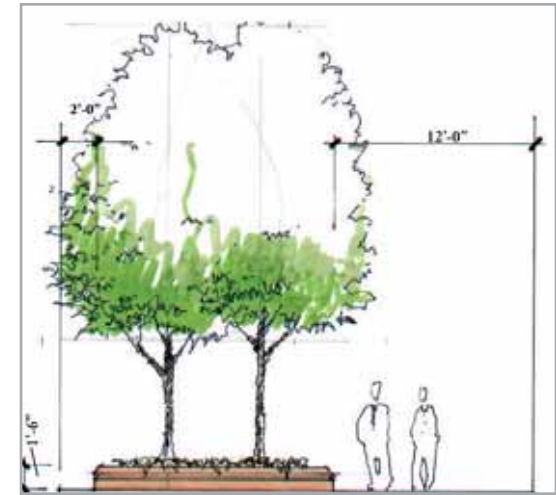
5th Street Streetscape: Typical Sidewalk Plans
